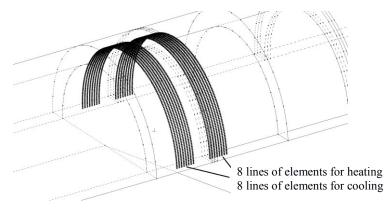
Auxiliary bodies for heating and cooling the surface of the tube
